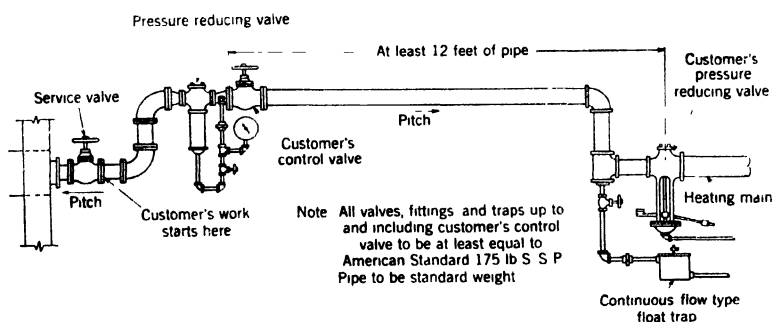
STAM SUPPLY CONNECTION WHEN USING TWO REDUCING VALVES
